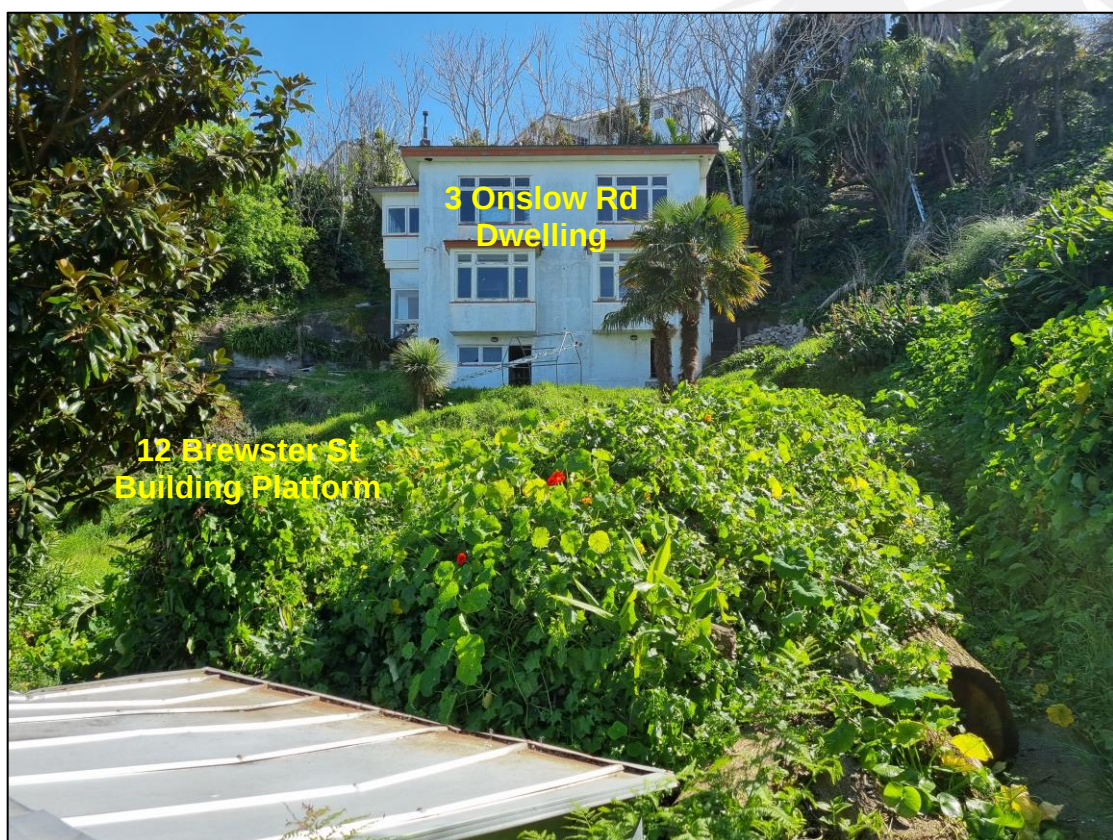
Existing dwelling at 3 Onslow Rd, and building platform of 12 Brewster St
